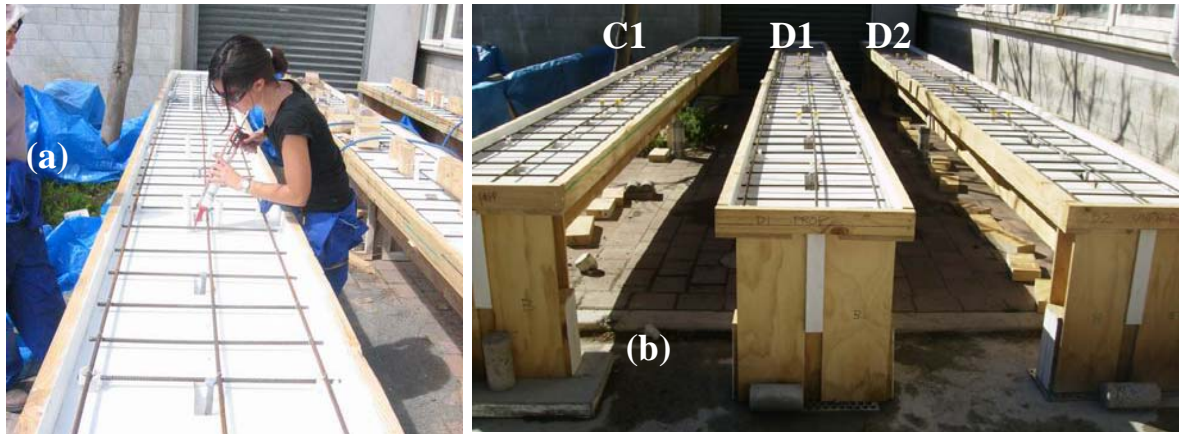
(a) Sealing holes in the formwork; (b) Beams C1, D1 and D2 ready for concreting
